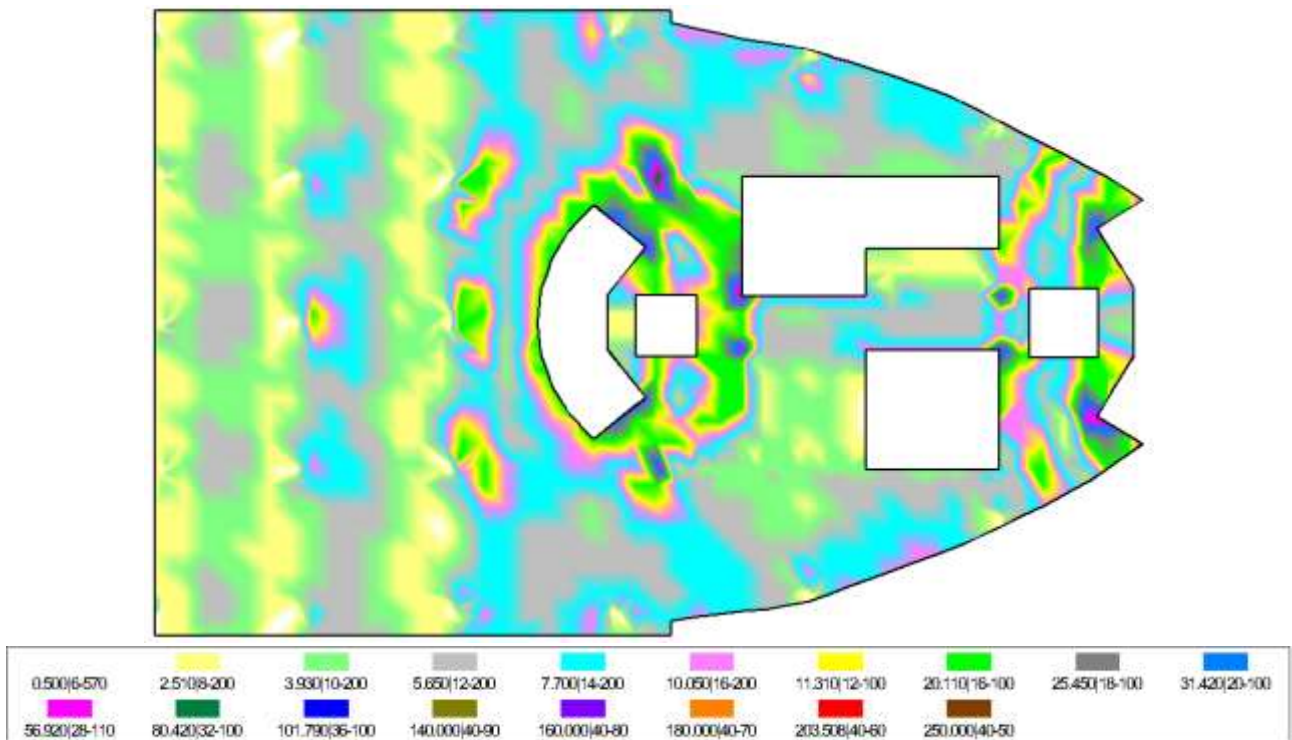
Reinforcement of the floor slab of the western tower at +42.80 m. Lower longitudinal reinforcement in the direction of the axis  $R$ ,  $\text{cm}^2/\text{m}$  [15]
